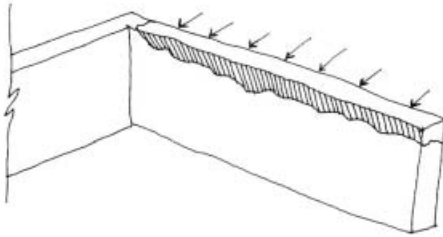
When a roof or bond beam is attached to a wall, the lateral forces can create a horizontal crack in the upper section of the wall.
